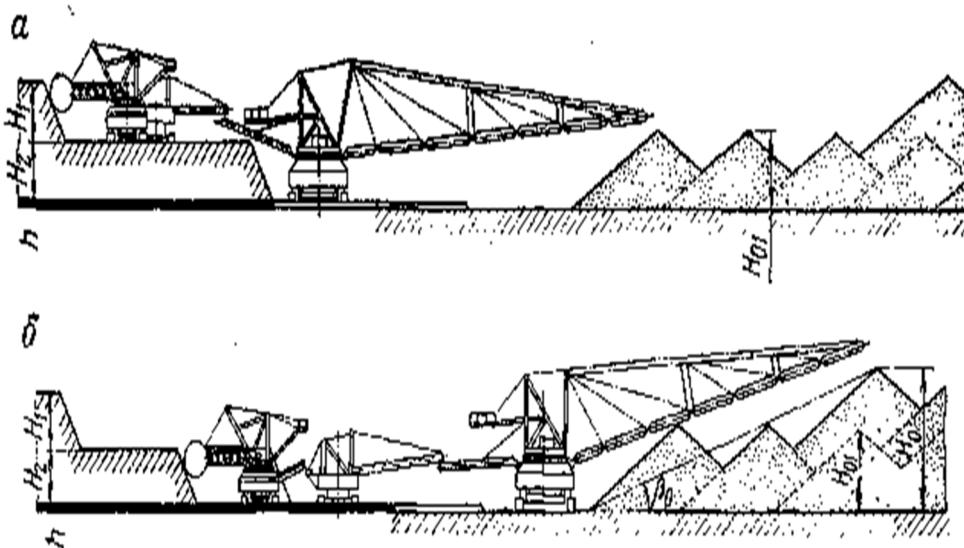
Two-stage scheme of excavation with a change in the standing horizon of the dumper.
